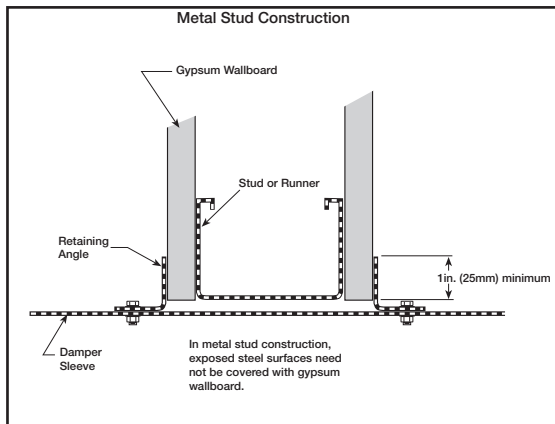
Detail of retaining angles and gypsum board application for metal and wooden stud construction.
